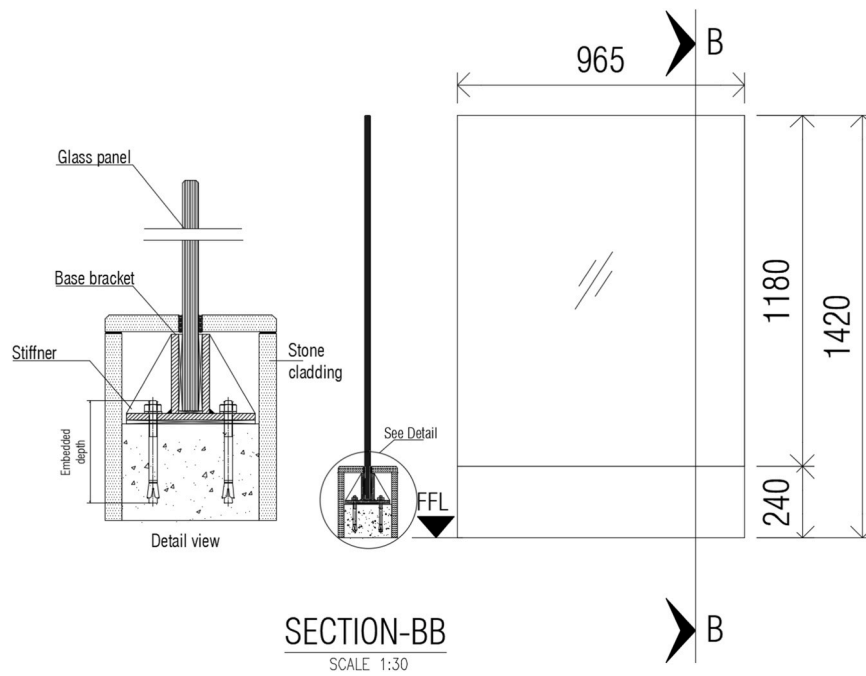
Frameless glass balustrade showing elevation, embedded base channel, and labelled structural components.
